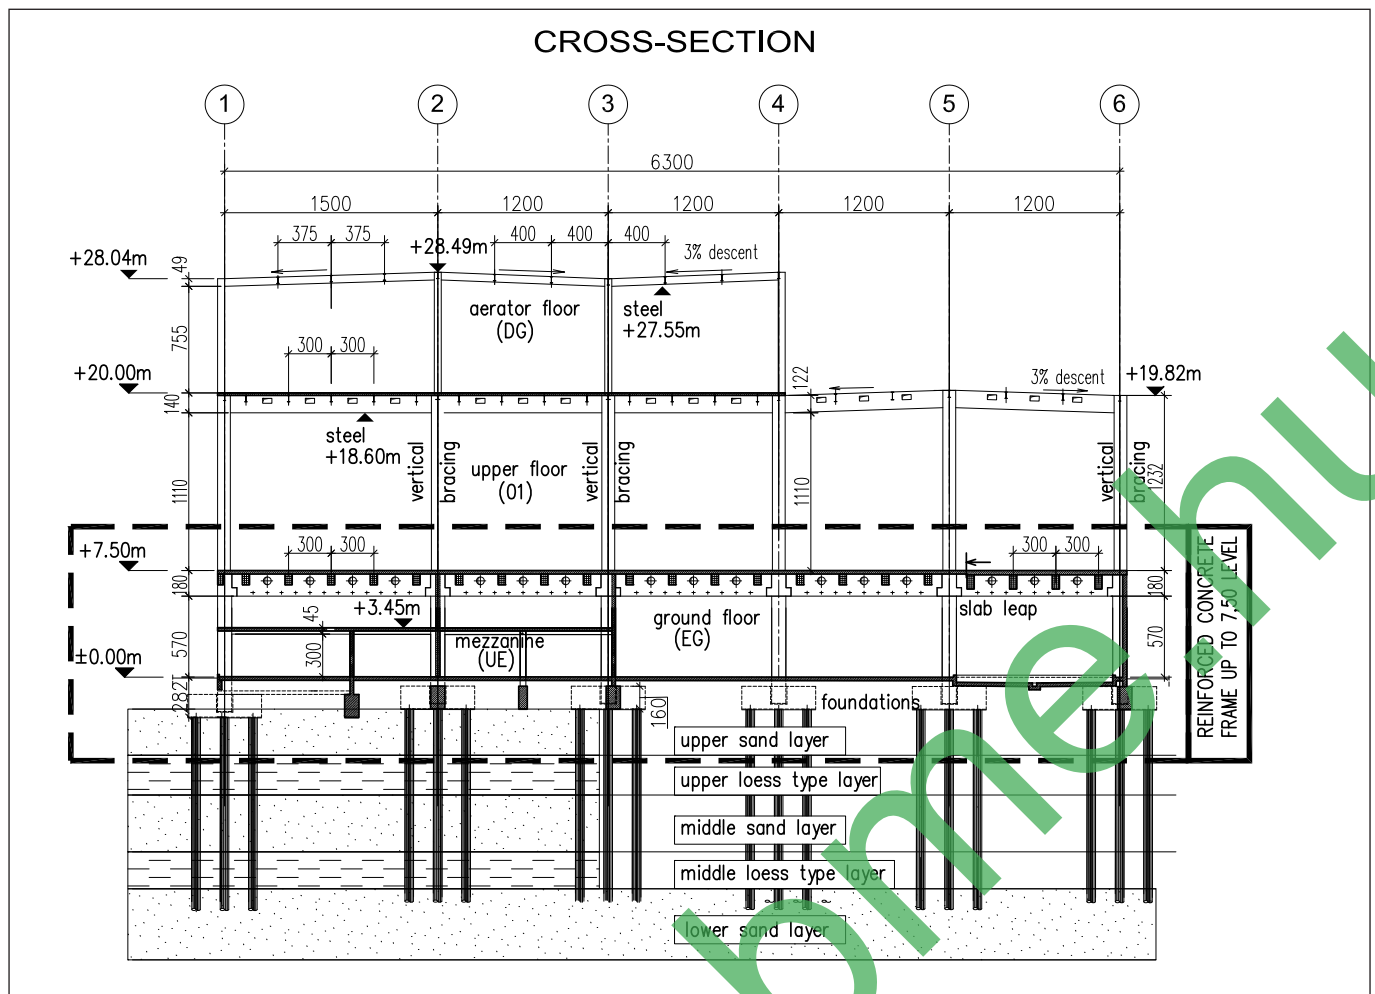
Cross section of the building - schema of the structural frame (detail from tender document)
